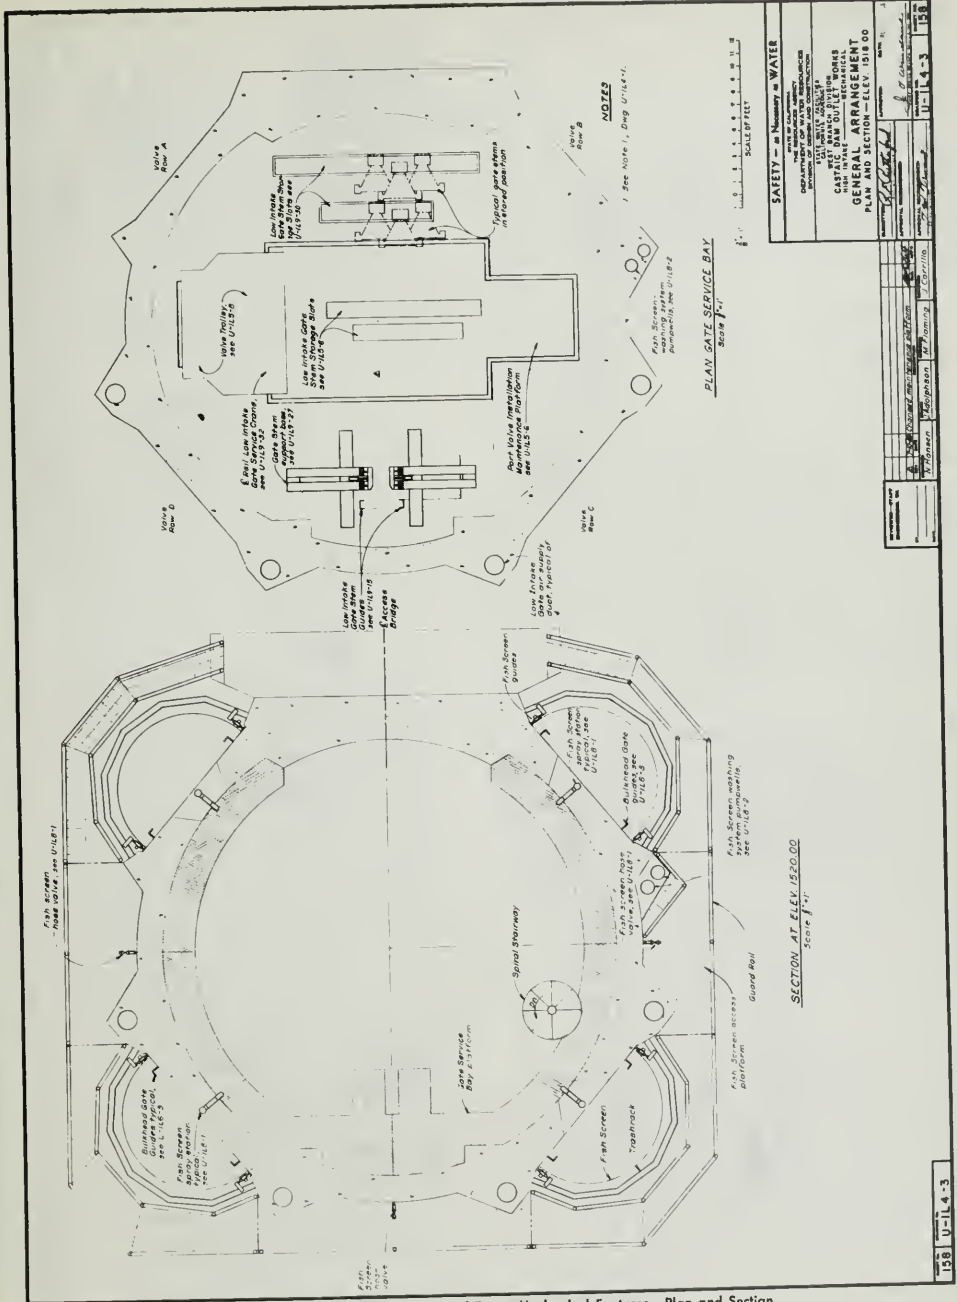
General Arrangement of Tower Mechanical Features—Plan and Section
